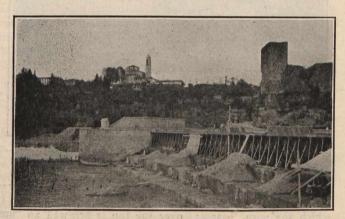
Trezzo, Dam with Collapsible Crest.
